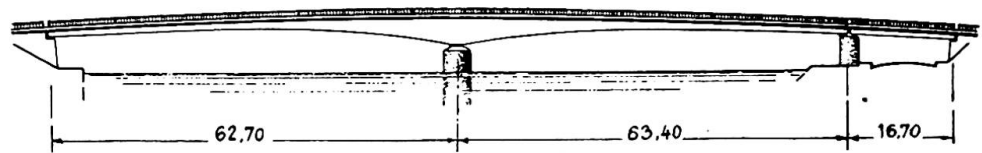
Bridge over the Meuse at Sclayn in prestressed concrete—Elevation
